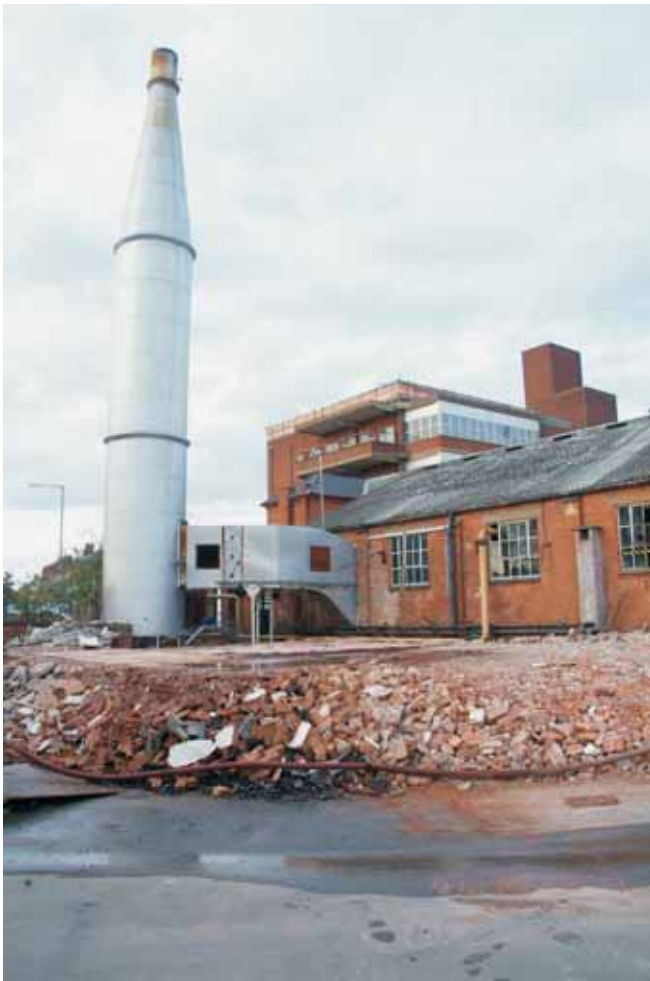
Building 8 – view to the north following the demolition of Building 7
